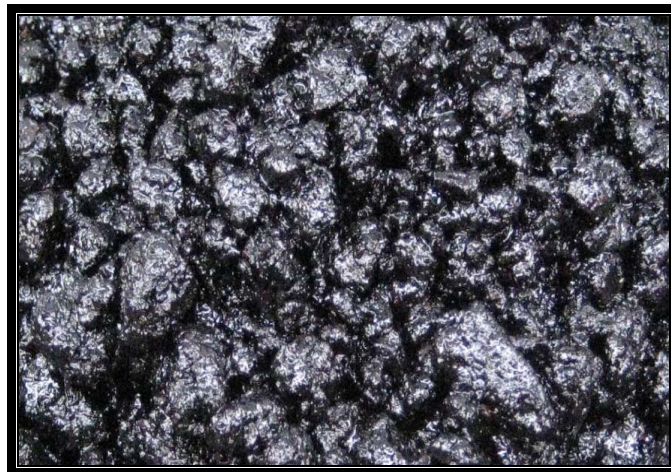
Asphalt concrete mixtures (aggregate, asphalt binder and air voids)
